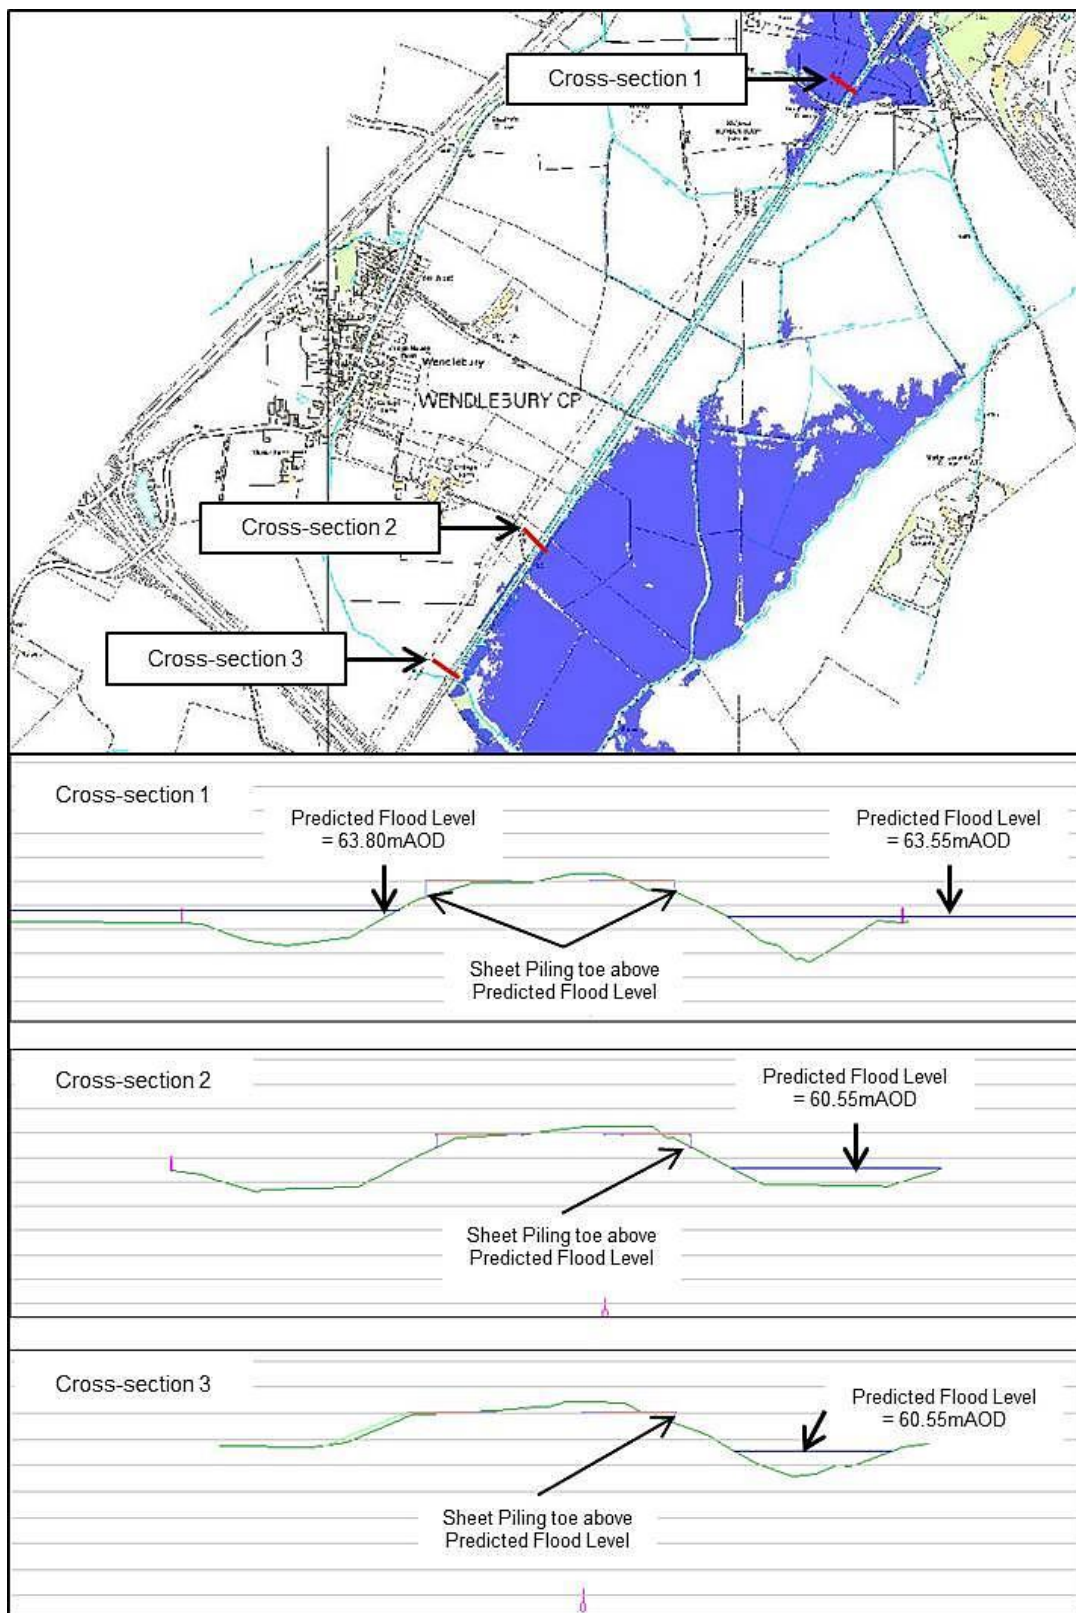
Cross Sections through the Railway Embankment within Active Flood Zone Areas Showing the Predicted Flood Level in Relation to the Proposed Embankment Stabilisation Works.
